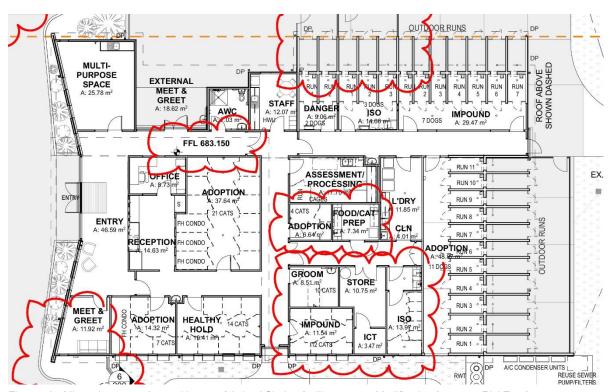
A: Minor changes to internal layout of Animal Shelter facility – s.4.55 Modification (source: F&J Tepa)
